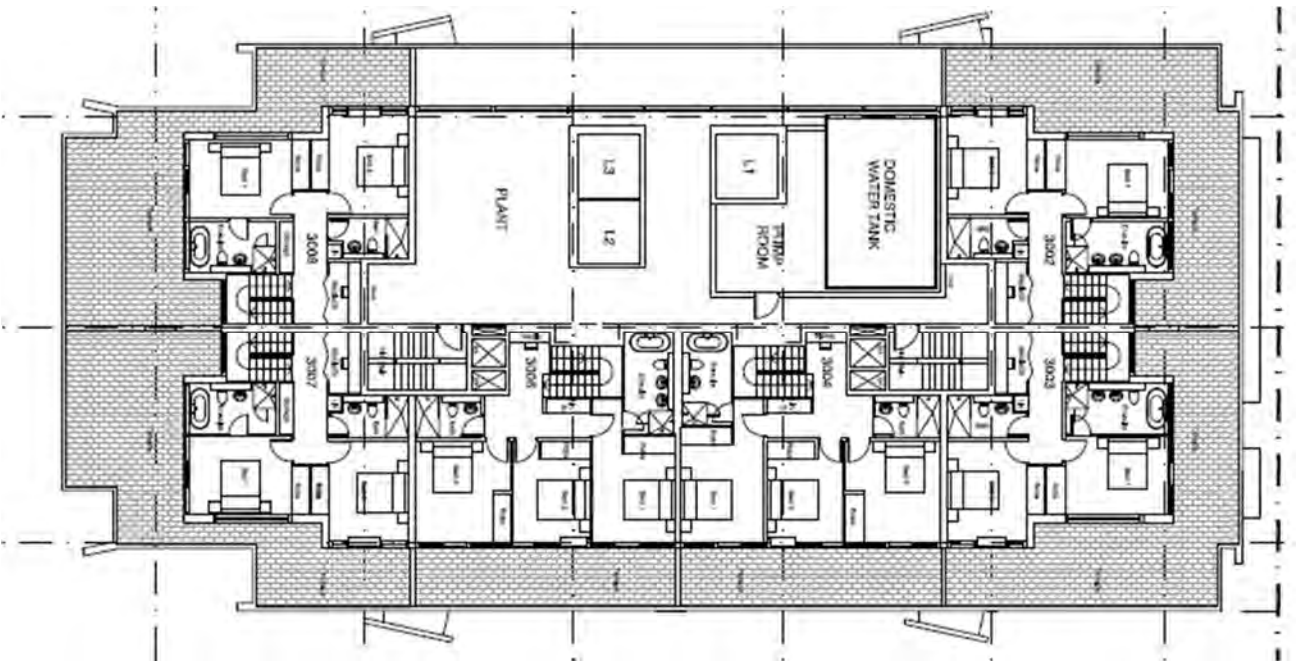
Building 1 Proposed Level 31 (extract Drawing No. A0109_C)
